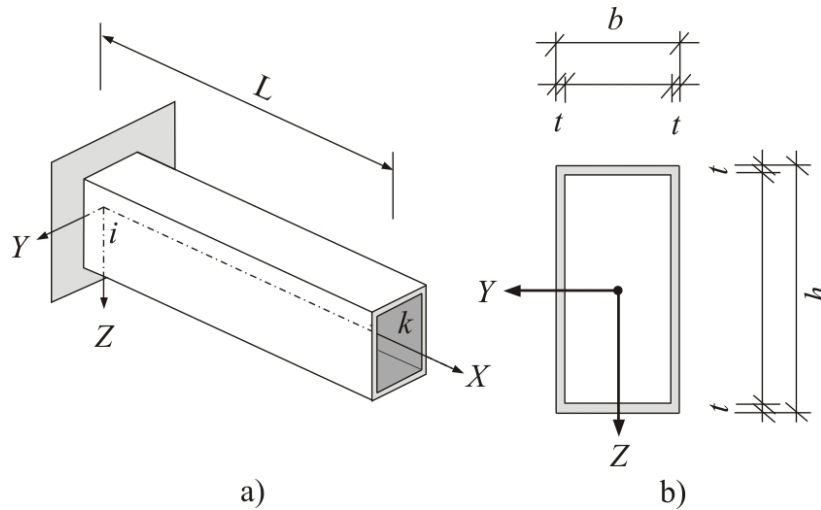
Cantilever beam with a rectangular hollow cross-section: a) system, b) cross-section.
